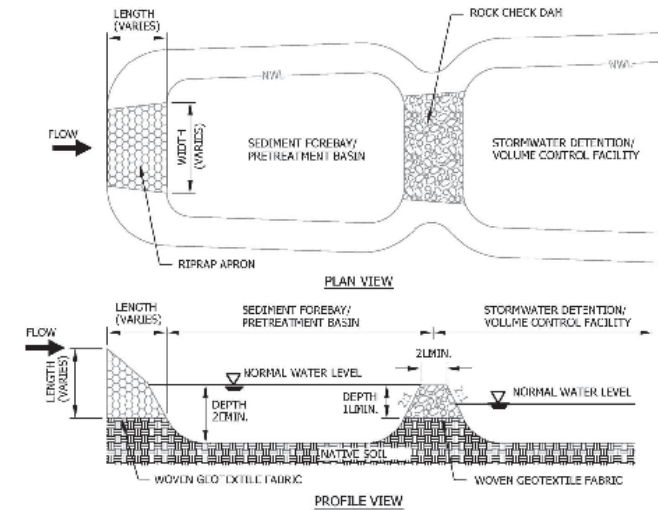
MWRD Technical Manual Typical Cross Section for Sediment Forebay
